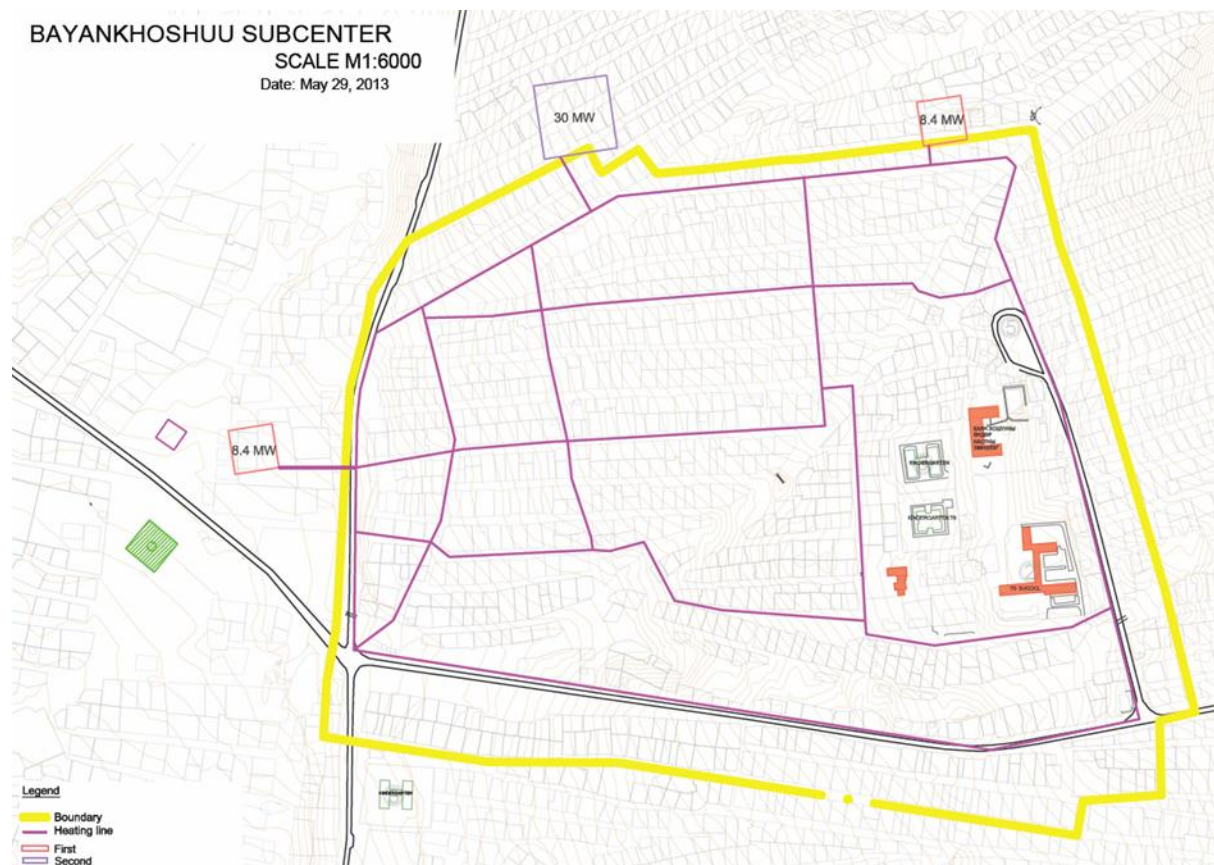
Water, Sewerage and Heating Infrastructure Construction
